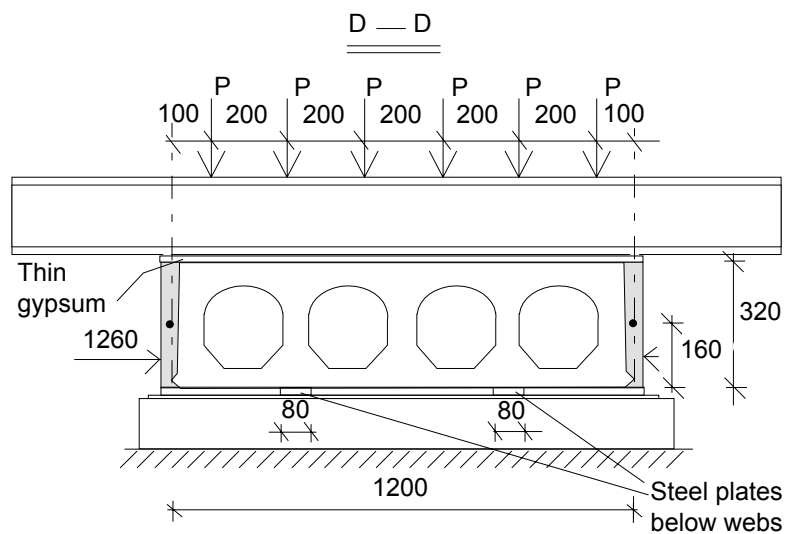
Tests B1 ... B3. Arrangements at support, section D – D, see Fig. 3.
